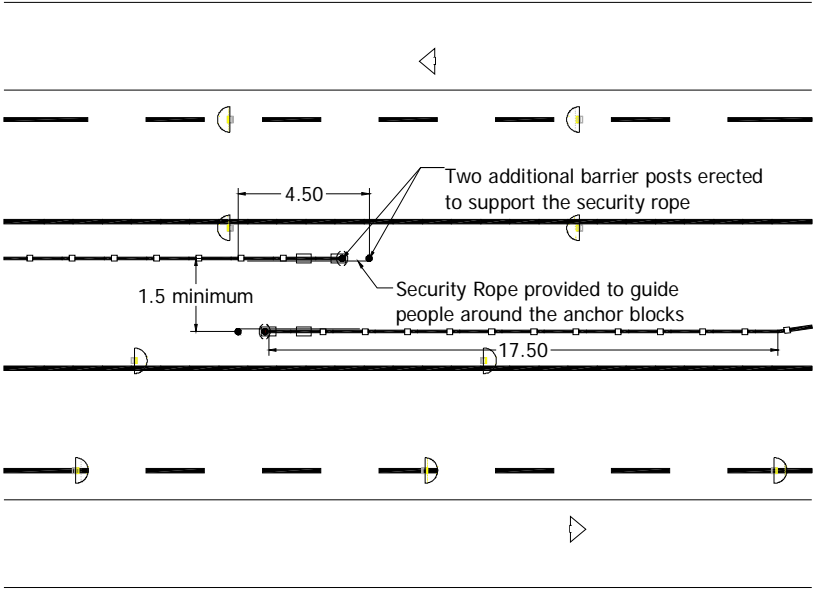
/13c Pedestrian Crossing Facilities at 1+1
